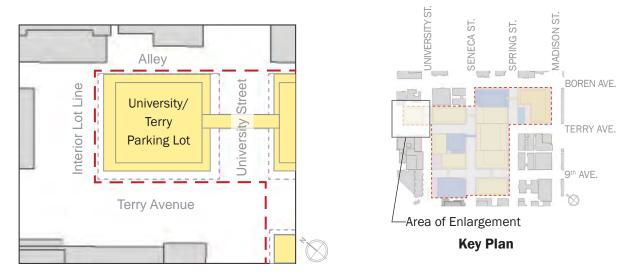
Proposed Building Setbacks – University/Terry Parking Lot Block
